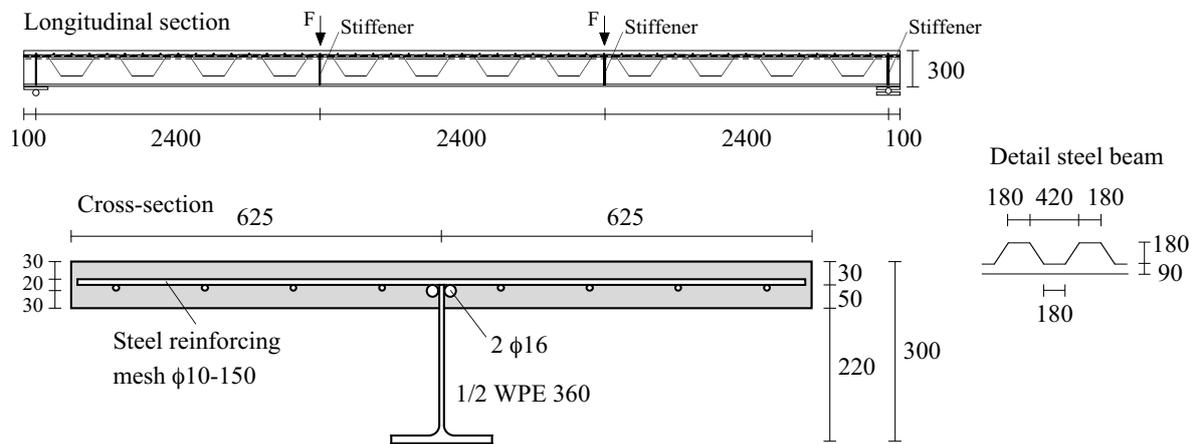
Steel-concrete composite beam with concrete slab on top (“beam I”)
